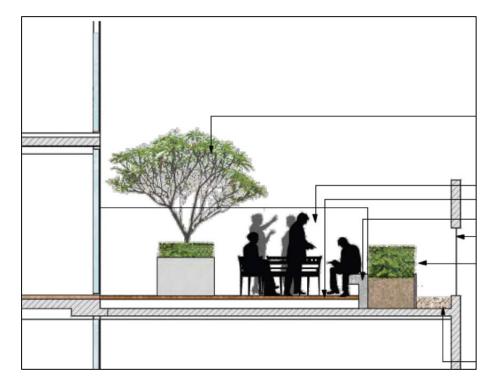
Sectional drawing illustrating indicative landscaping planter beds on private balconies
